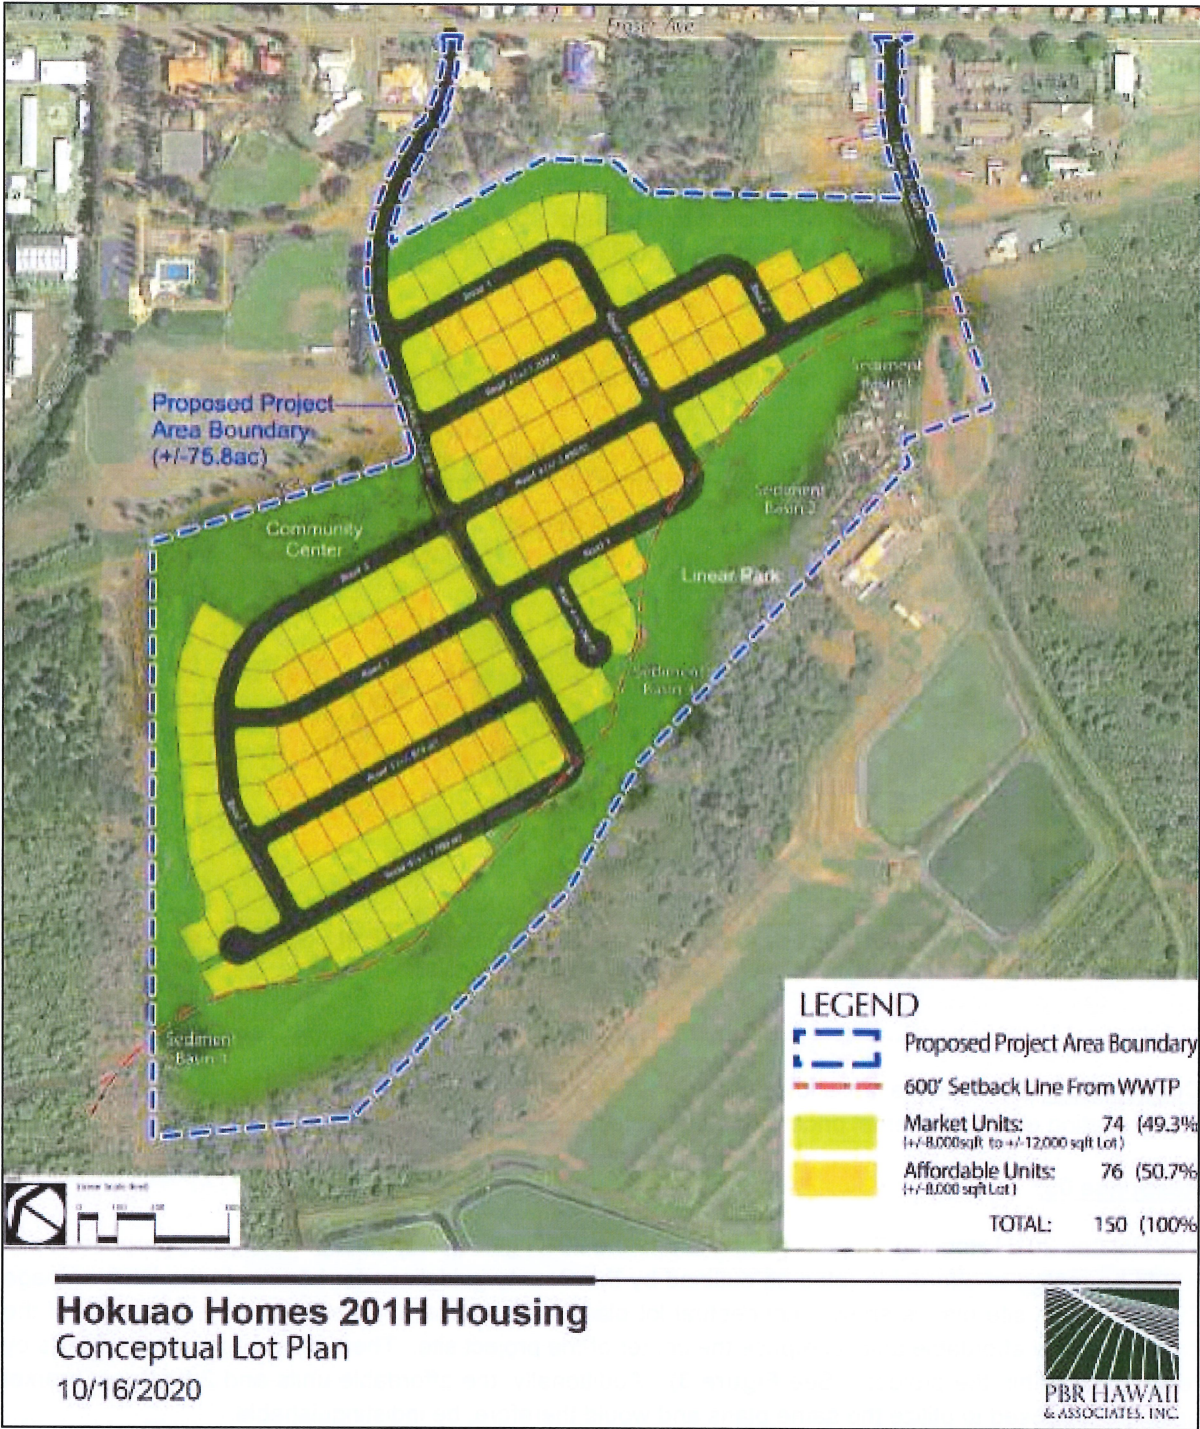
Market units are identified as "neon" green on the perimeter of the site plan and affordable units are identified as "orange" in the interior of the site plan.
